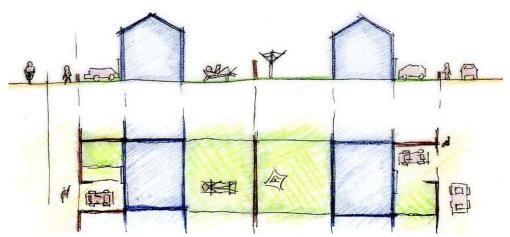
image showing rear gardens backing on to rear gardens, this arrangement provides adequate private amenity and a separation distance to safeguard privacy/outlook.
